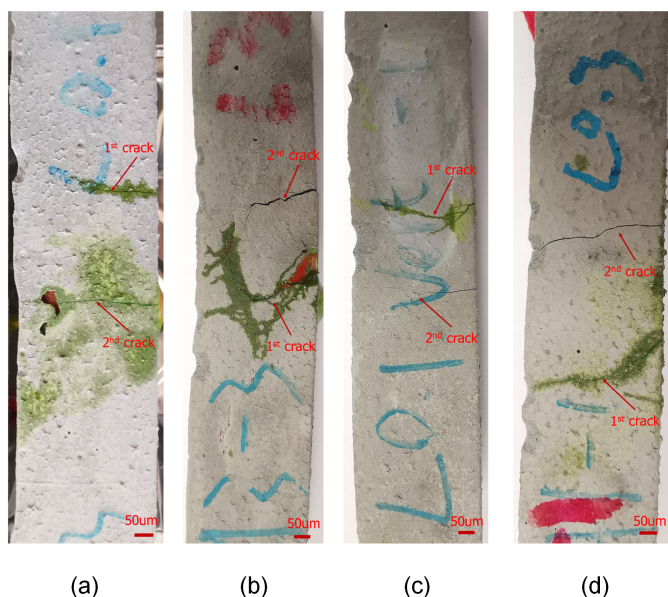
Crack morphology after the second 4-point bending test (a) L1H; (b) L3H; (c) L1V; (d) L3V (side view of the specimens).
